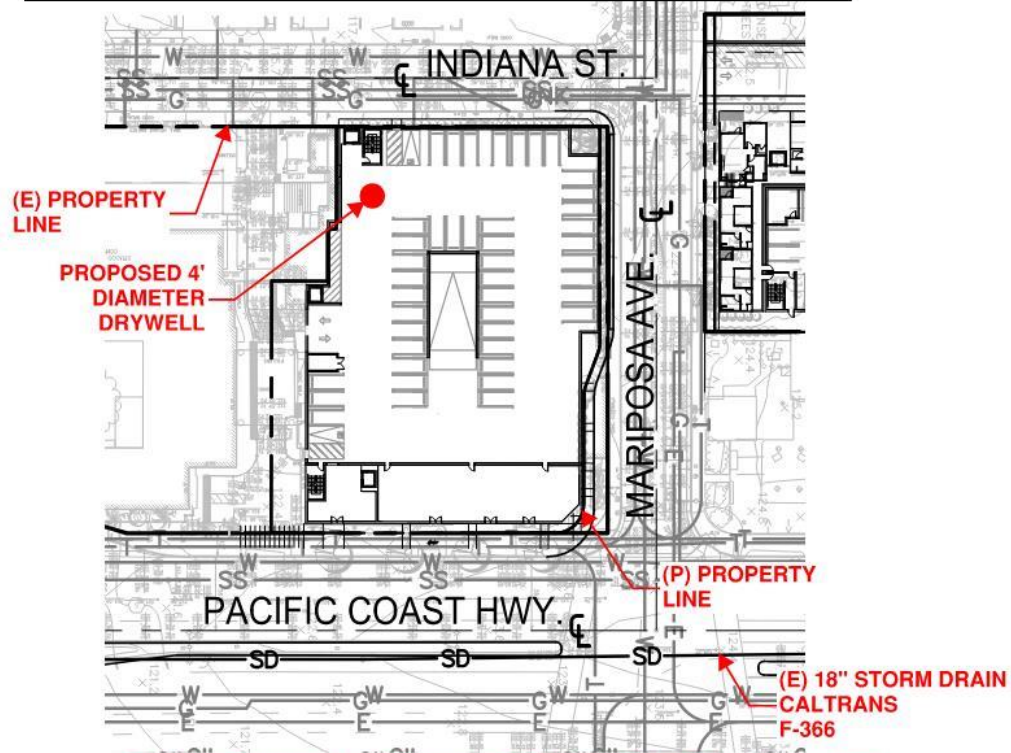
C EXISTING DRAINAGE PLAN FAIRFIELD PARKING SITE IN THE PCC COM-3 DISTRICT
